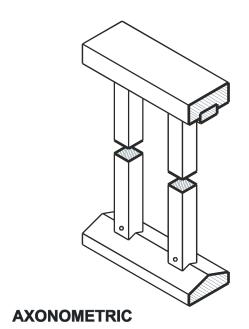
Exterior Connection: Infill Picket Nailed to Endcap - Endcap Screwed to Rail
